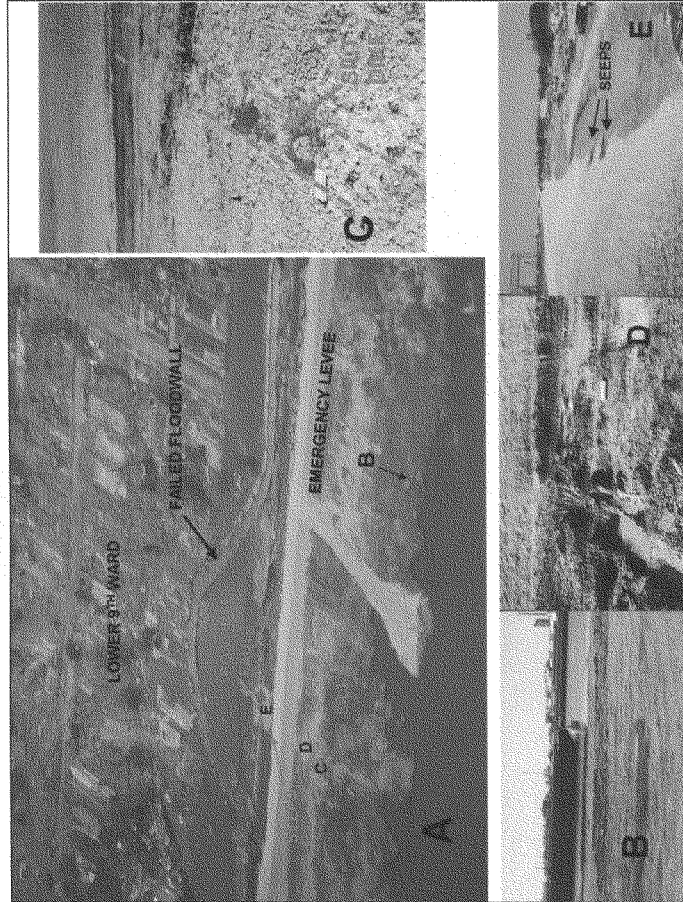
Floodwall breach on the east side of the Inner Harbor Navigation Canal in New Orleans. A. View looking southeast across area of floodwall failure. Uprooted steel sheet piles capped with concrete are clearly visible. B. View of canal looking west. Water level in the canal is approximately 1 to 1.5 feet below batture land level. Except where disturbed by vehicle movement, the batture in this area is grass-covered and not deeply scoured by water flow. C. Water seepage through possible silt dike. D. Seepage through possible silt dike at base of emergency levee, canal side. E. Seepage at base of emergency levee, east side. These seepage patches align with the possible silt dike on the west side of the levee.
